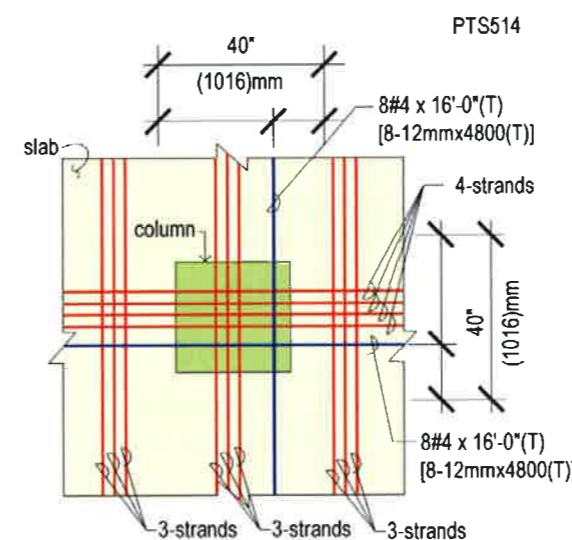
Plan - Column Support and Reinforcement in Slab
